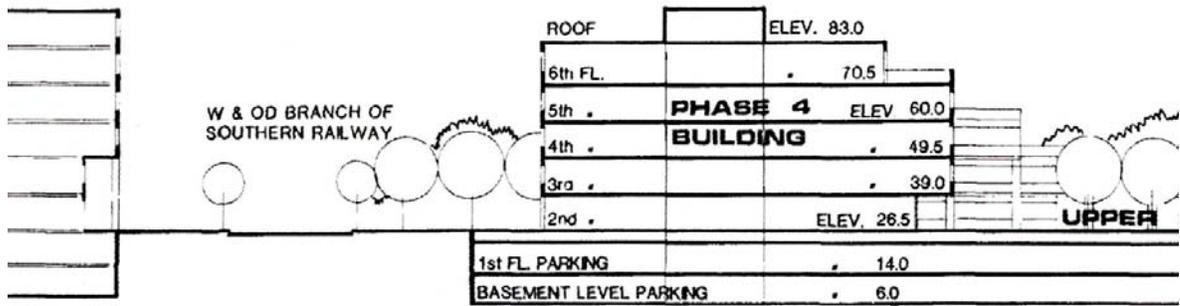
Section through Canal Center building, showing underground parking garage levels and their corresponding elevations. Courtesy of the City of Alexandria.
